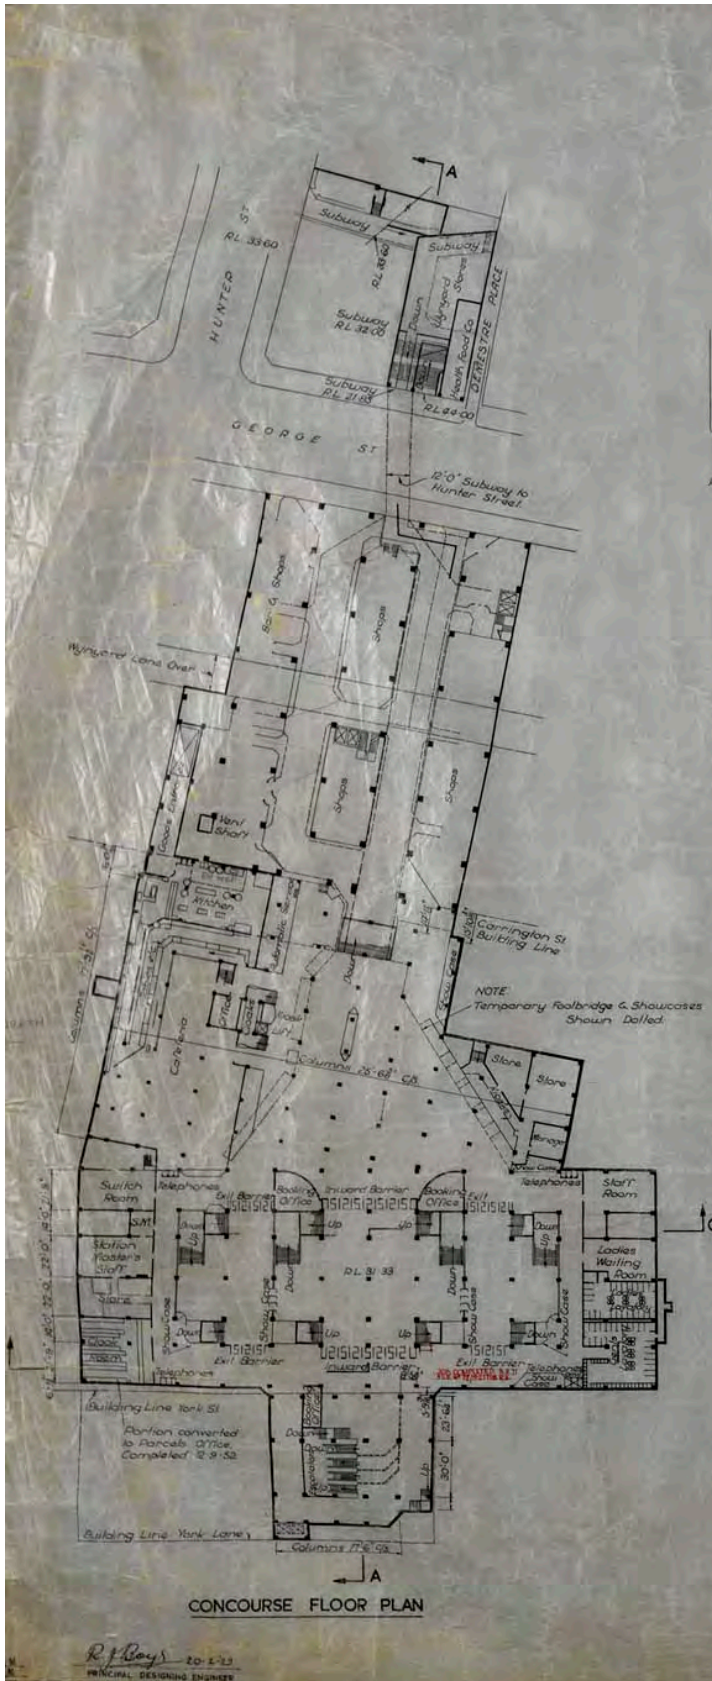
Detail from the 1929 plan of the pedestrian subway from Wynyard Station under the study area to George Street, showing the general arrangement of the station complex with the escalators, stairs and subway exits. Also note the two arcades of shops exiting onto George Street and the location of Carrington Street, Wynyard Lane and George Street. (Source: State Records R121 10.C.123)
